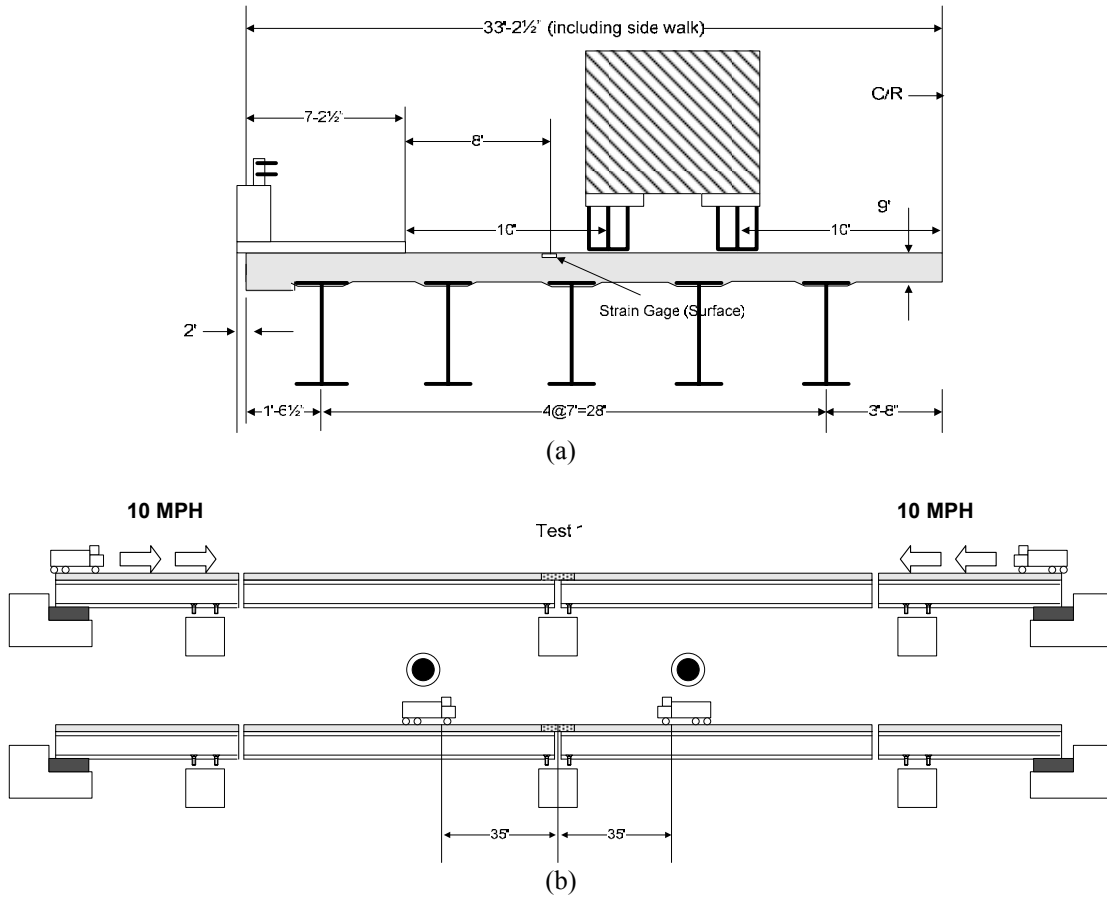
(a) Transverse truck location of Test #1; (b) Load plan for Test #1
